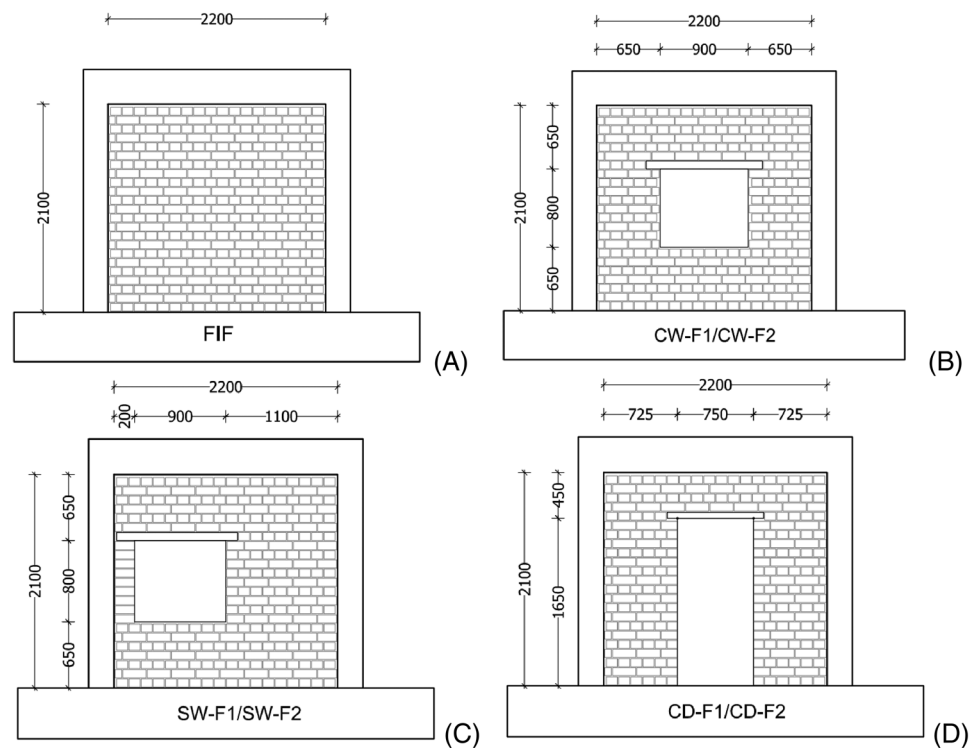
Geometric details of specimens: (A) IF; (B) CW; (C) SW; (D) CD. Dimensions in mm.
